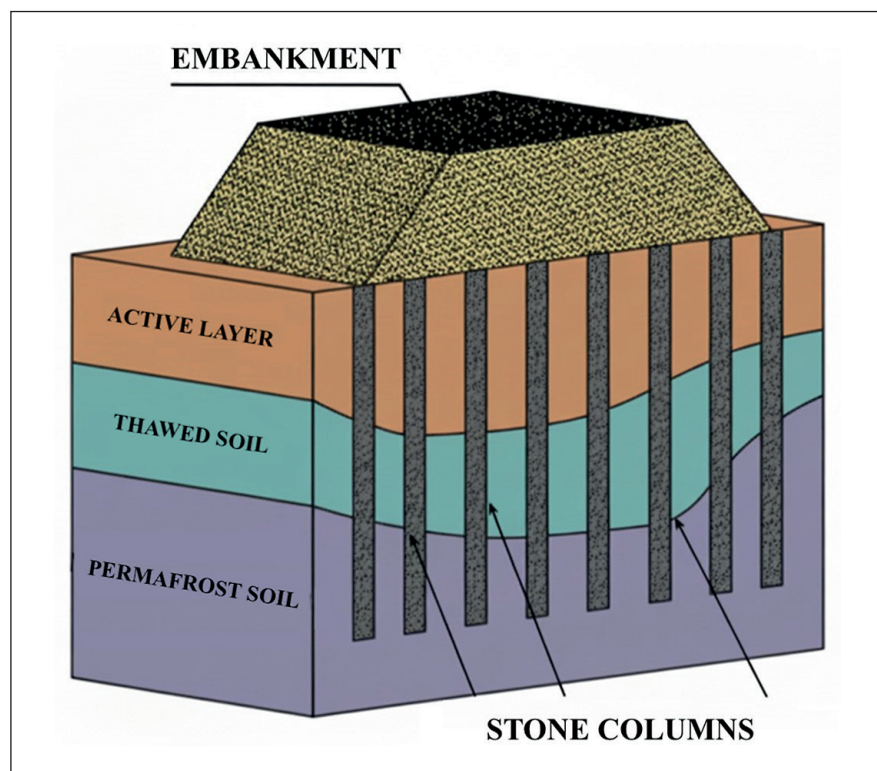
Transport embankment with foundation reinforced by vertical crushed stone columns (crushed stone piles) on permafrost soils (PS)
